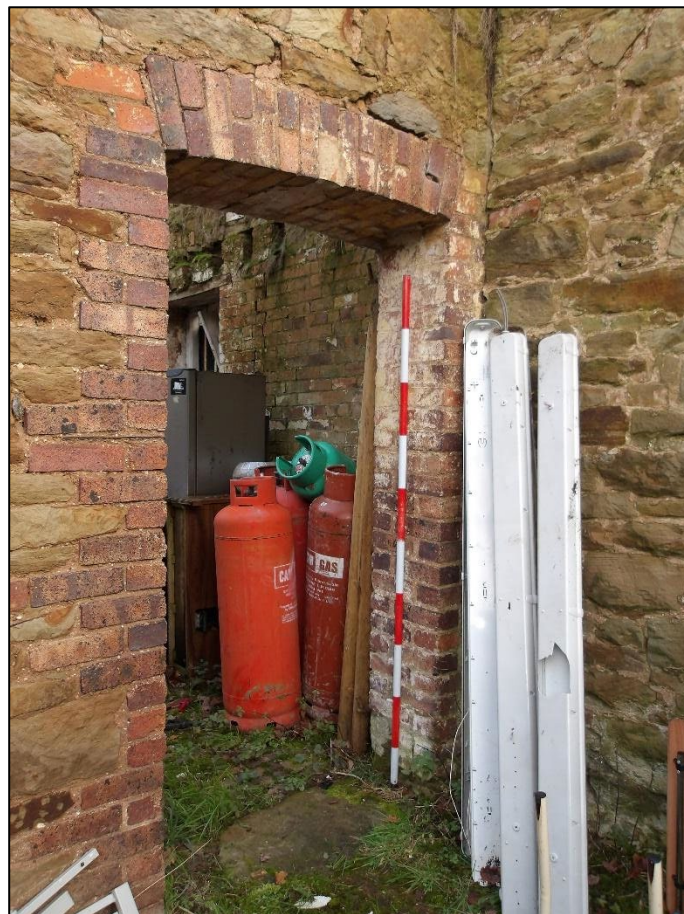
Doorway leading to stables interior. View northeast. 2m scale
